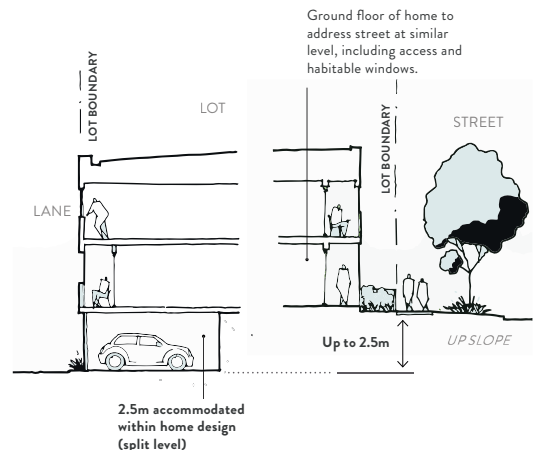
| Slope Response G - Townhouse/ Split Level Home: Back to Front Slope (up to 2.5m)
